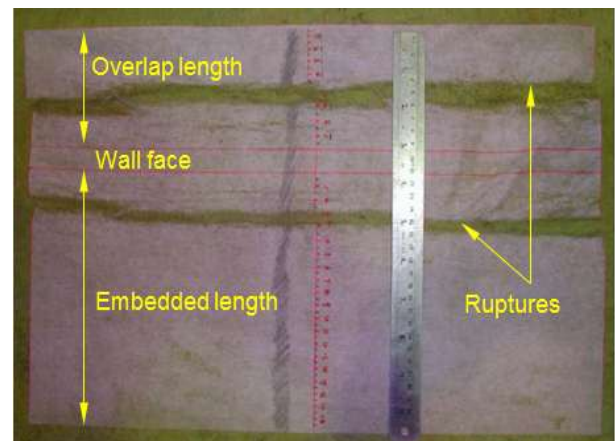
Breakage pattern in reinforcement material after wall failure
